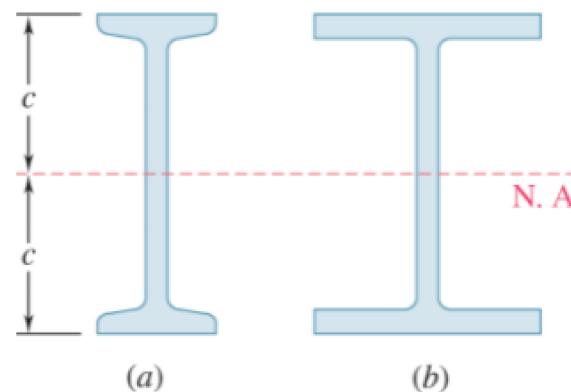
Two types of steel beam cross sections: (a) American Standard beam (S), (b) wide-flange beam (W).
